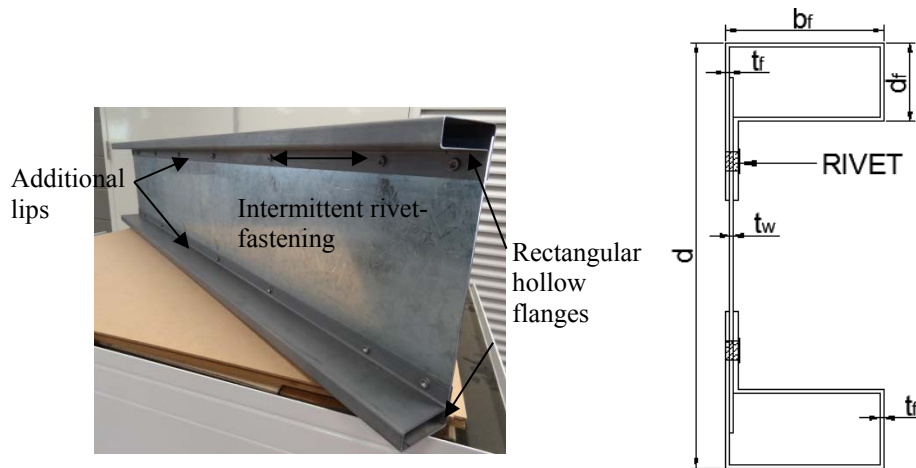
Rivet-Fastened Rectangular Hollow Flange Channel Beam
